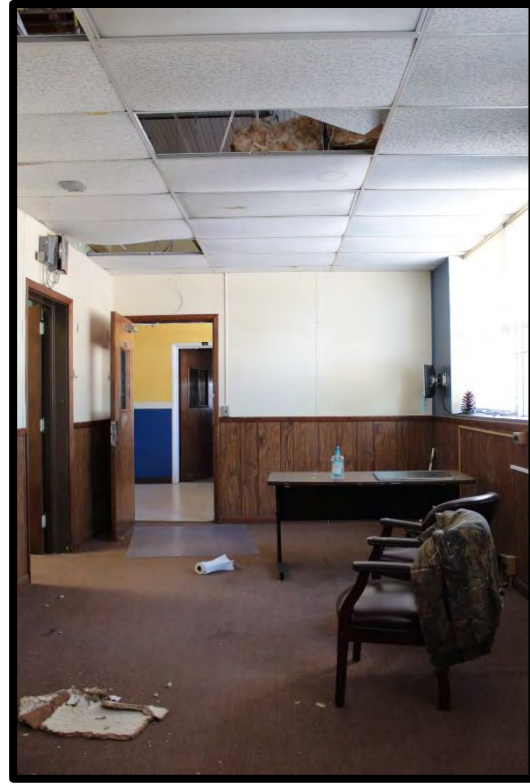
Cerro Gordo School, Divided Office Space with Paneling and Drywall.
